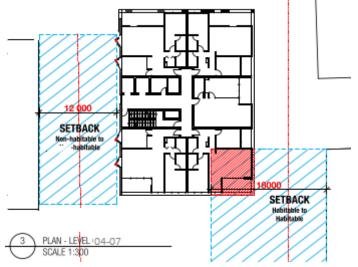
Plan showing Level 4-7 floor plan of 26 Shepherd St and the building separation distances of 20 and 28 Shepherd Street.
